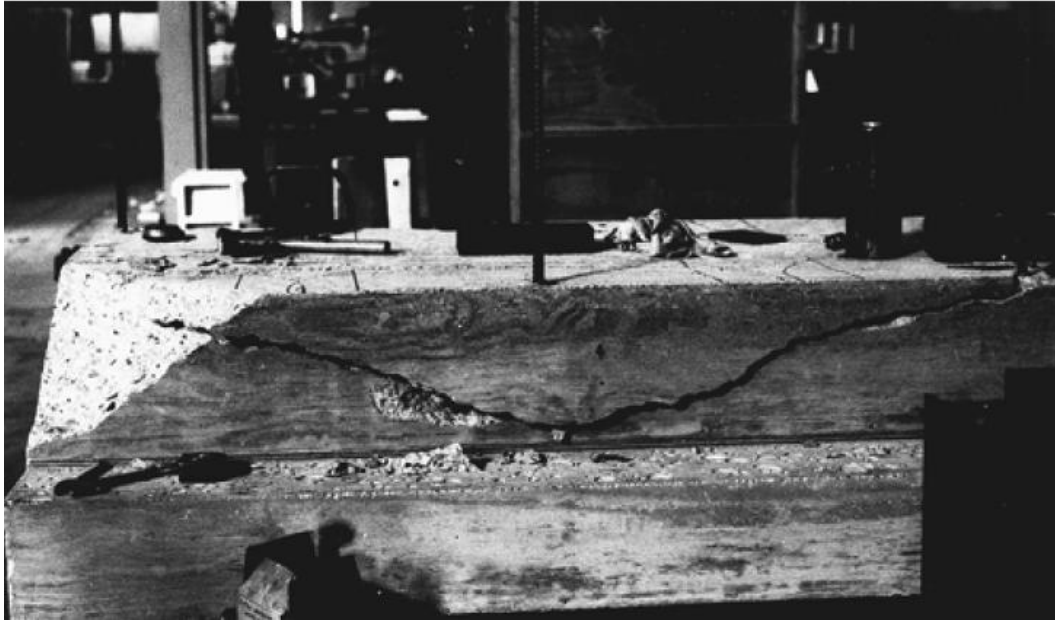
Concrete Breakout failure in a shallow embedment test (DeVries et al. 1999)
